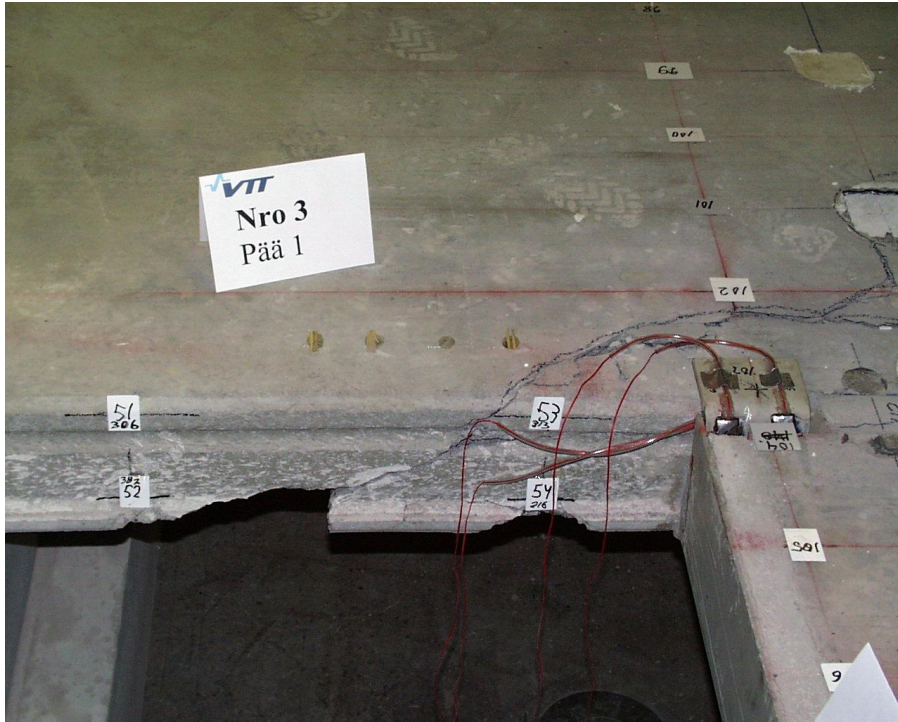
FT200:12. Cracks on edge of slab 3 after failure.
